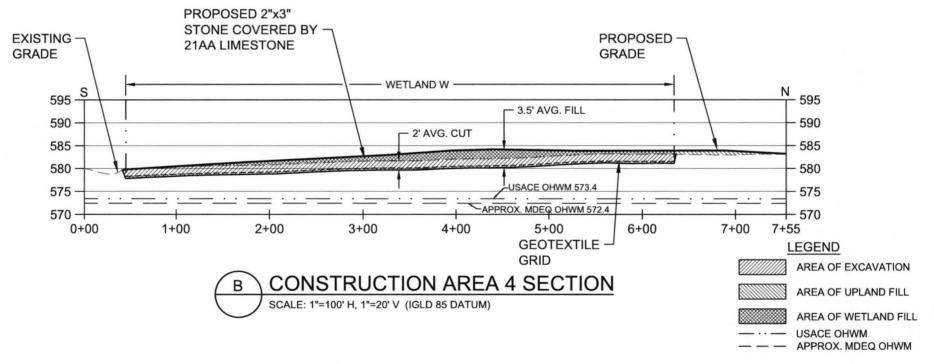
B CONSTRUCTION AREA 4 SECTION DETAILS
